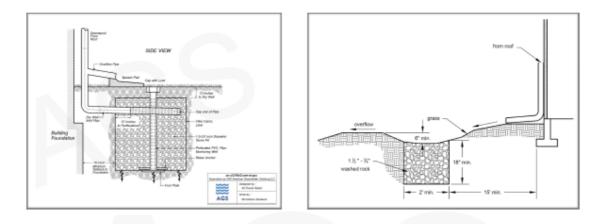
Typical Plan and drawings for Dry Well Construction (Closed System) Source: American Groundwater Solutions
